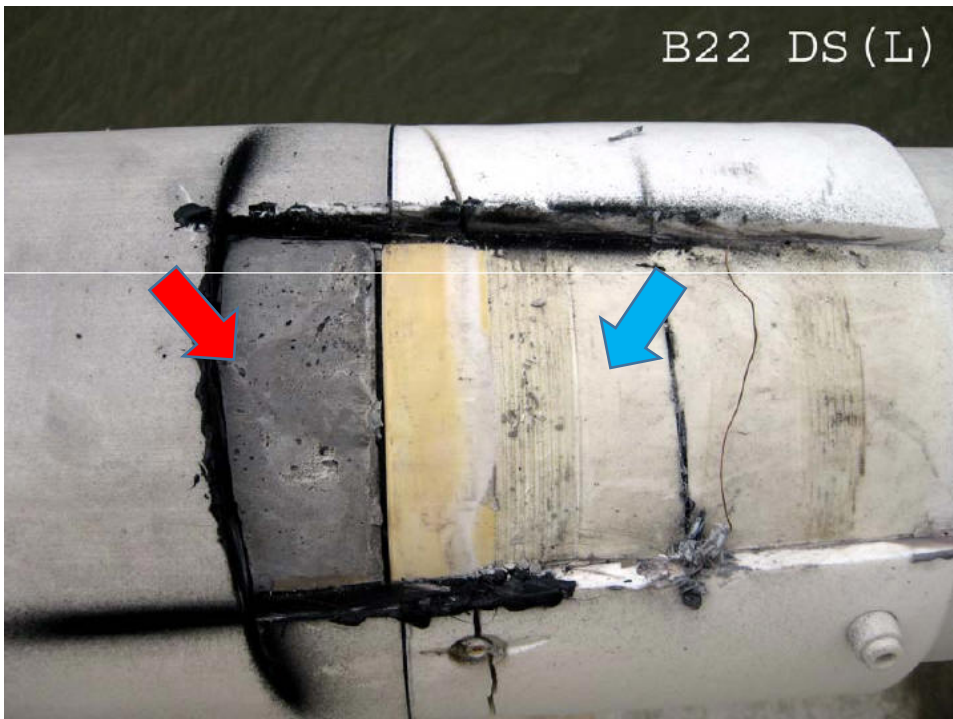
Connection Sleeve and Coupler after Coupon Extraction. Note Grout (Red Arrow) and the Transition Pipe (Blue Arrow).
